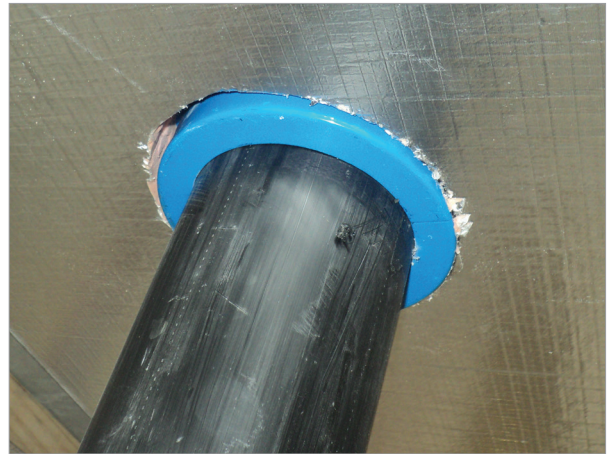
Penetration example - Kingspan Kooltherm® K10 G2 Soffit Board installed tight around the fire collar and HDPE service pipe.
